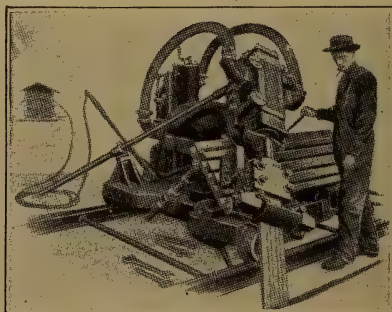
Front View of the "Electric-Air" Channeler, Showing It Adjusted for Making a Transfer Cut.
